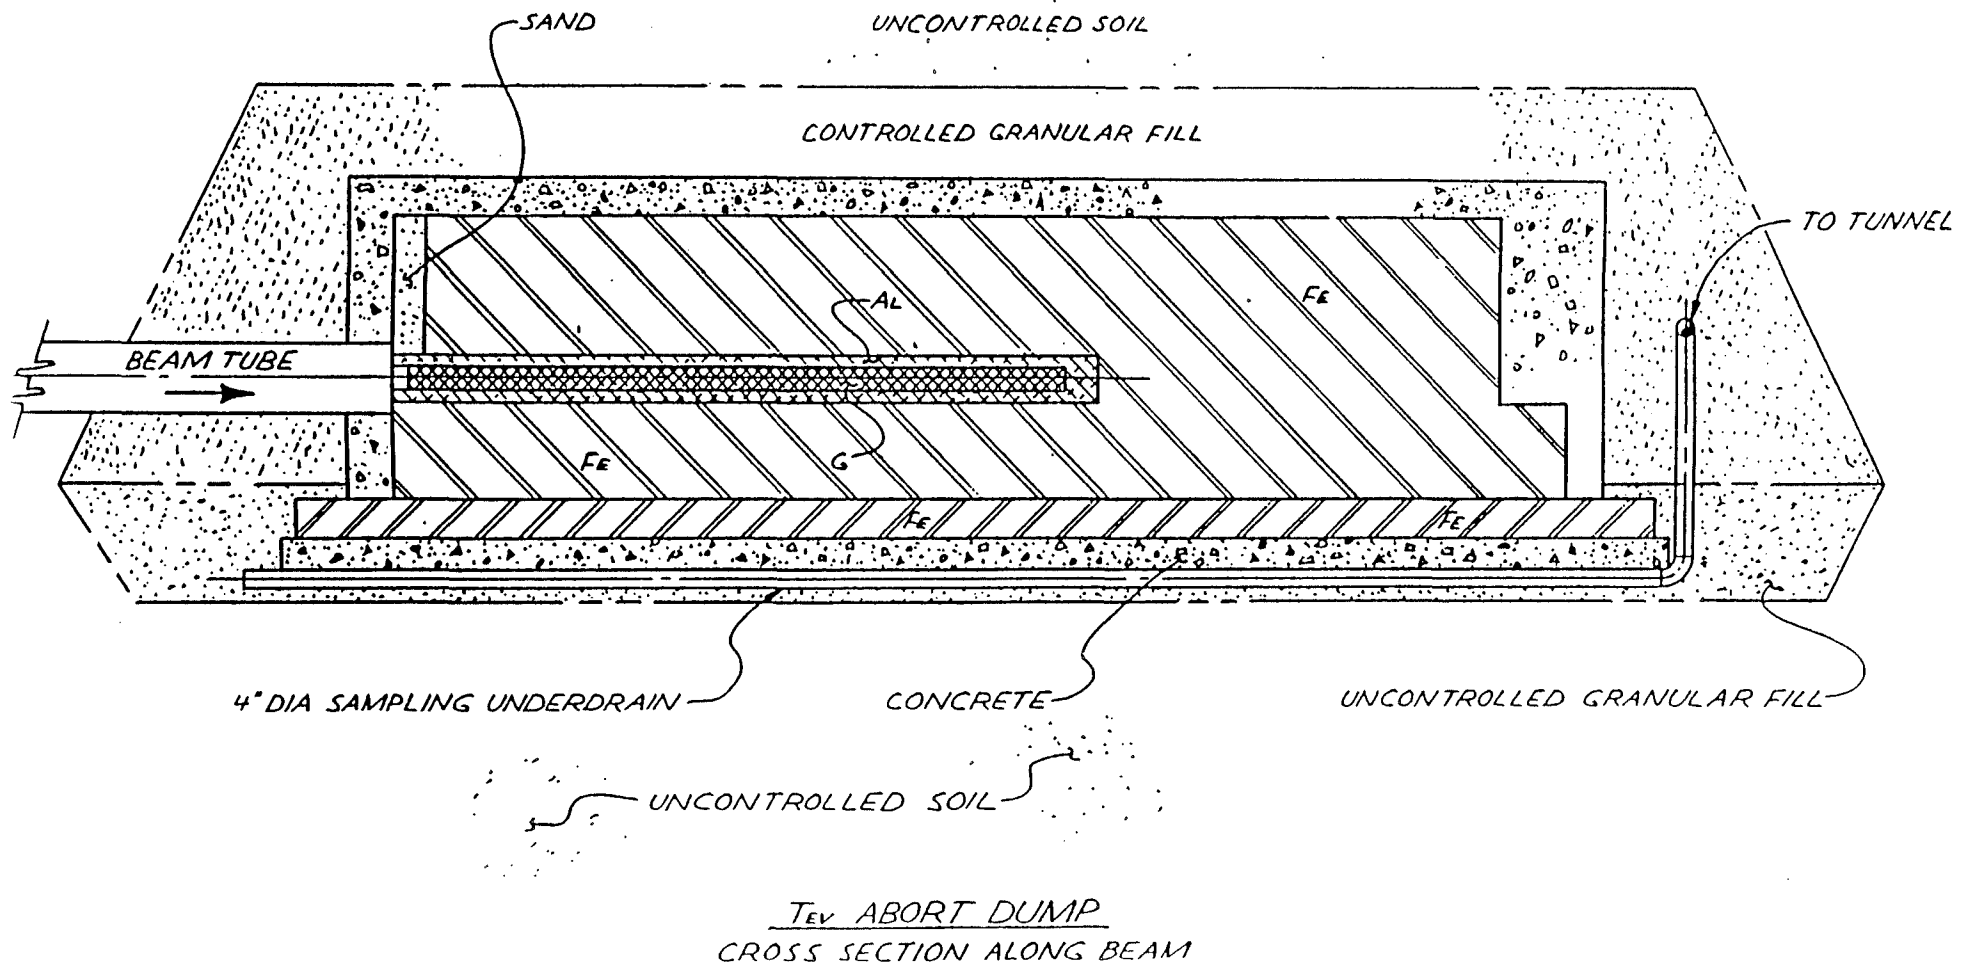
Longitudinal Section of Tevatron Abort Dump
